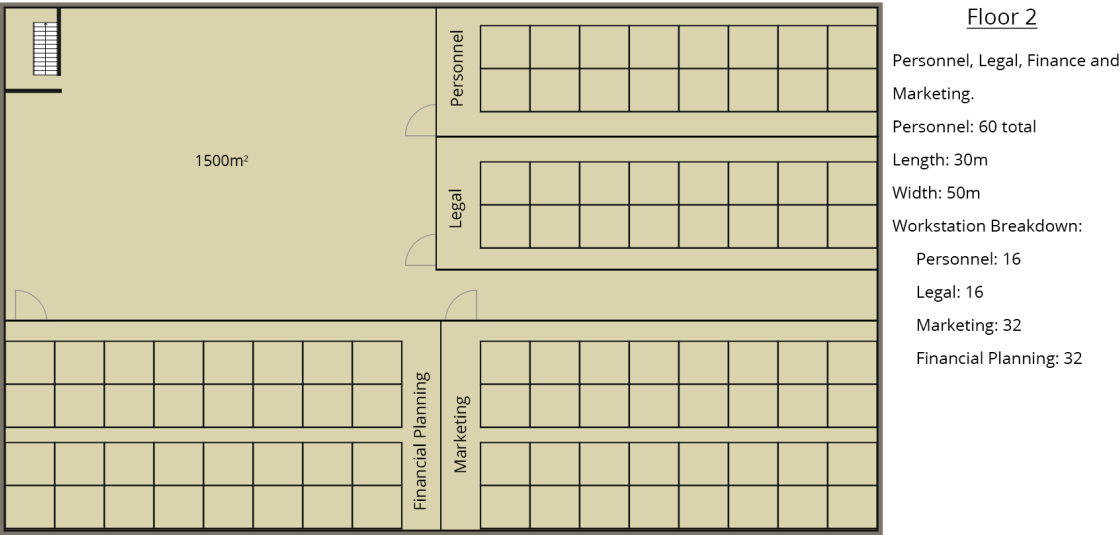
2nd floor floor plan combining 4 different departments
